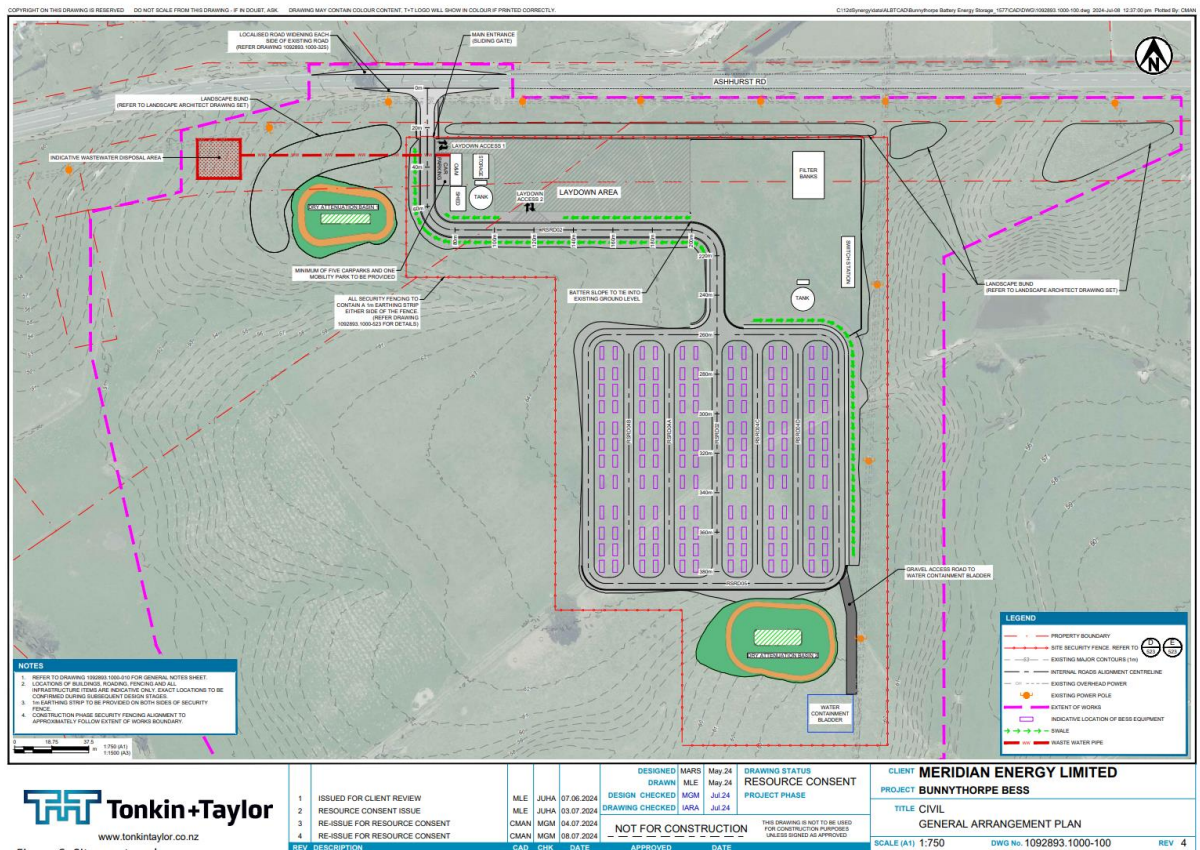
The site master plan showing the location of the wastewater disposal area (red square top left), dry attenuation basins (green oval shapes), laydown area and building locations (top middle) and water containment bladder (bottom right middle).
